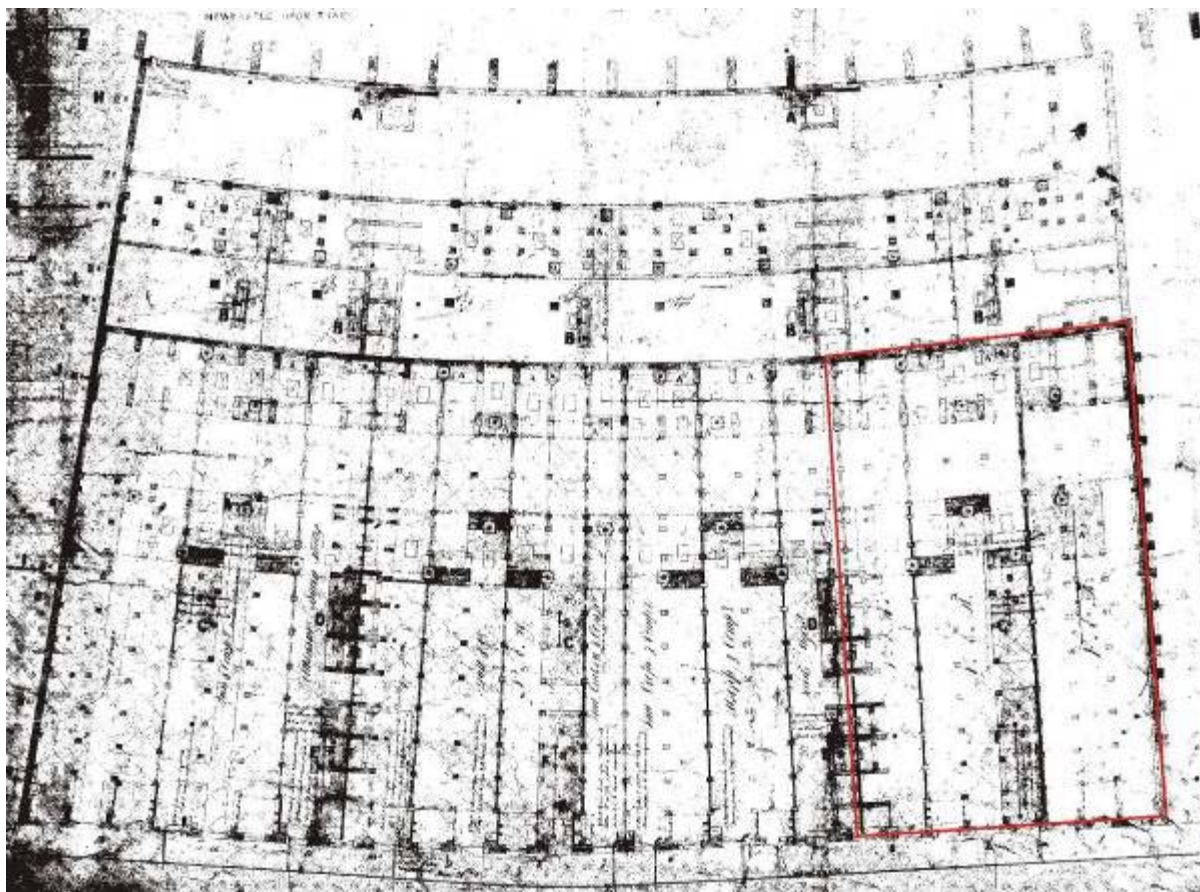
1866 building control plan of the goods station undercroft with extent of current survey outlined in red, NER ref 130
